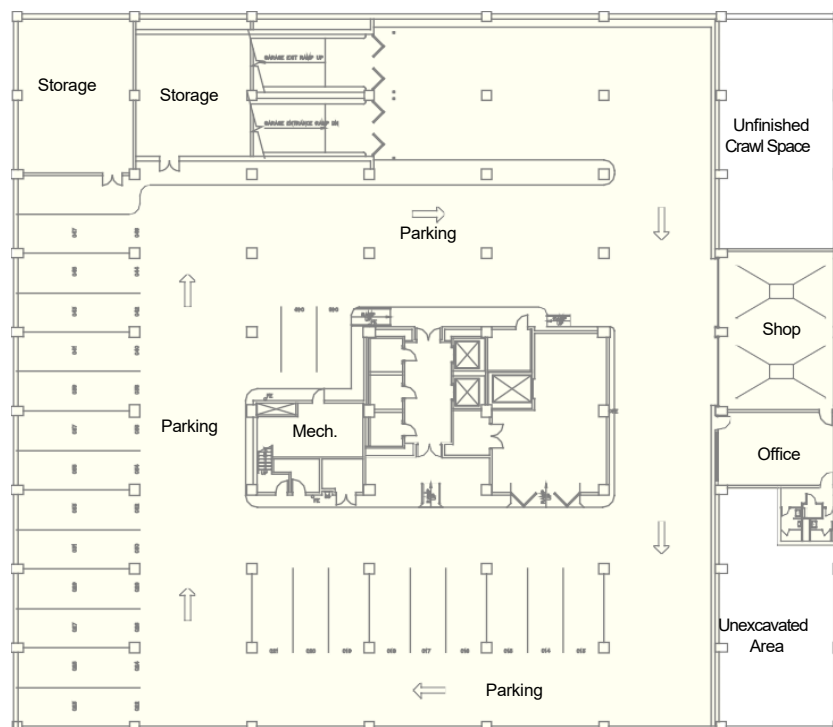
The floor plan layout depicts a basement with unfinished crawl space and unexcavated space, which are excluded from the Gross Area. The coloring depicts the Gross Area of this floor plan.
